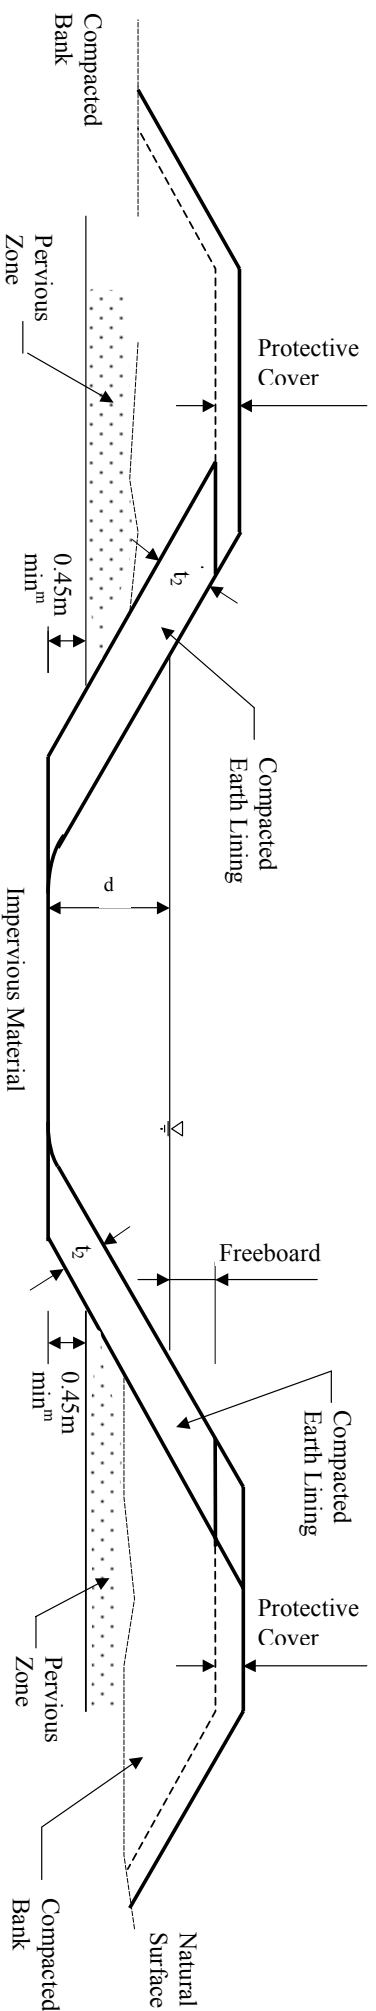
Typical Compacted Earth Lined Section – Batters only
